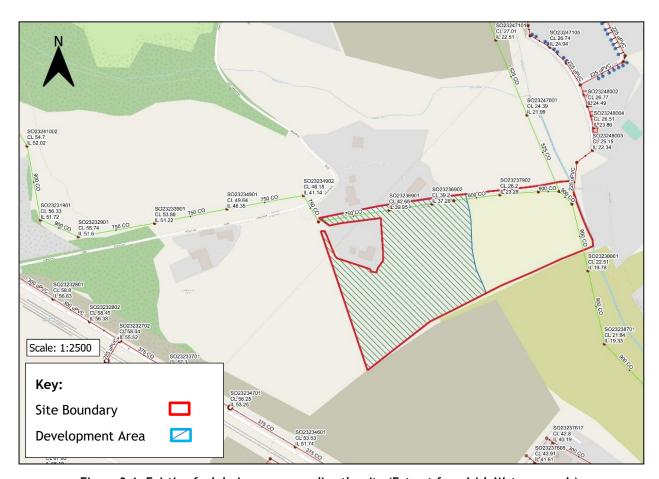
Existing foul drainage surrounding the site (Extract from Irish Water records)
